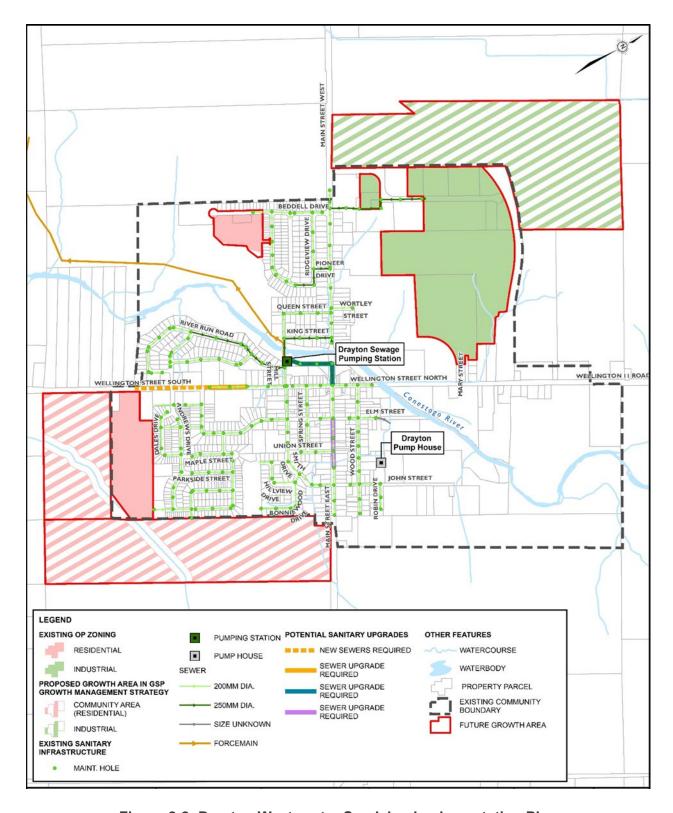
Drayton Wastewater Servicing Implementation Plan
